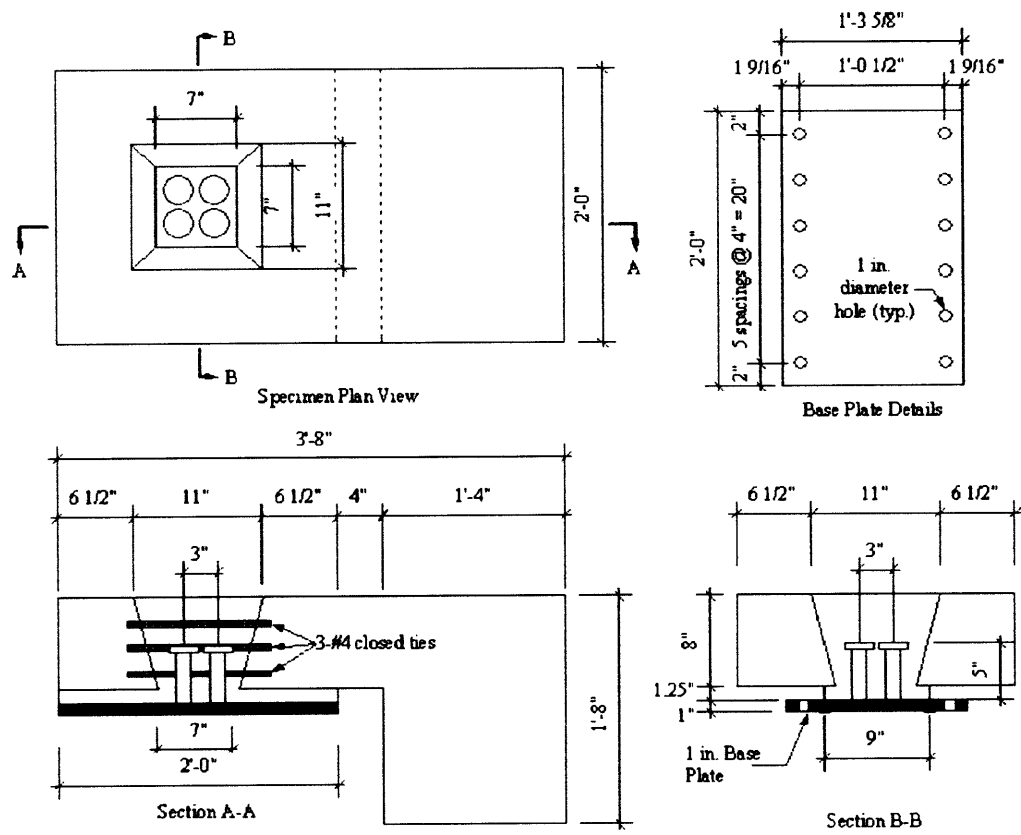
Concrete dimensions of the four-stud closed-tie confinement specimen
